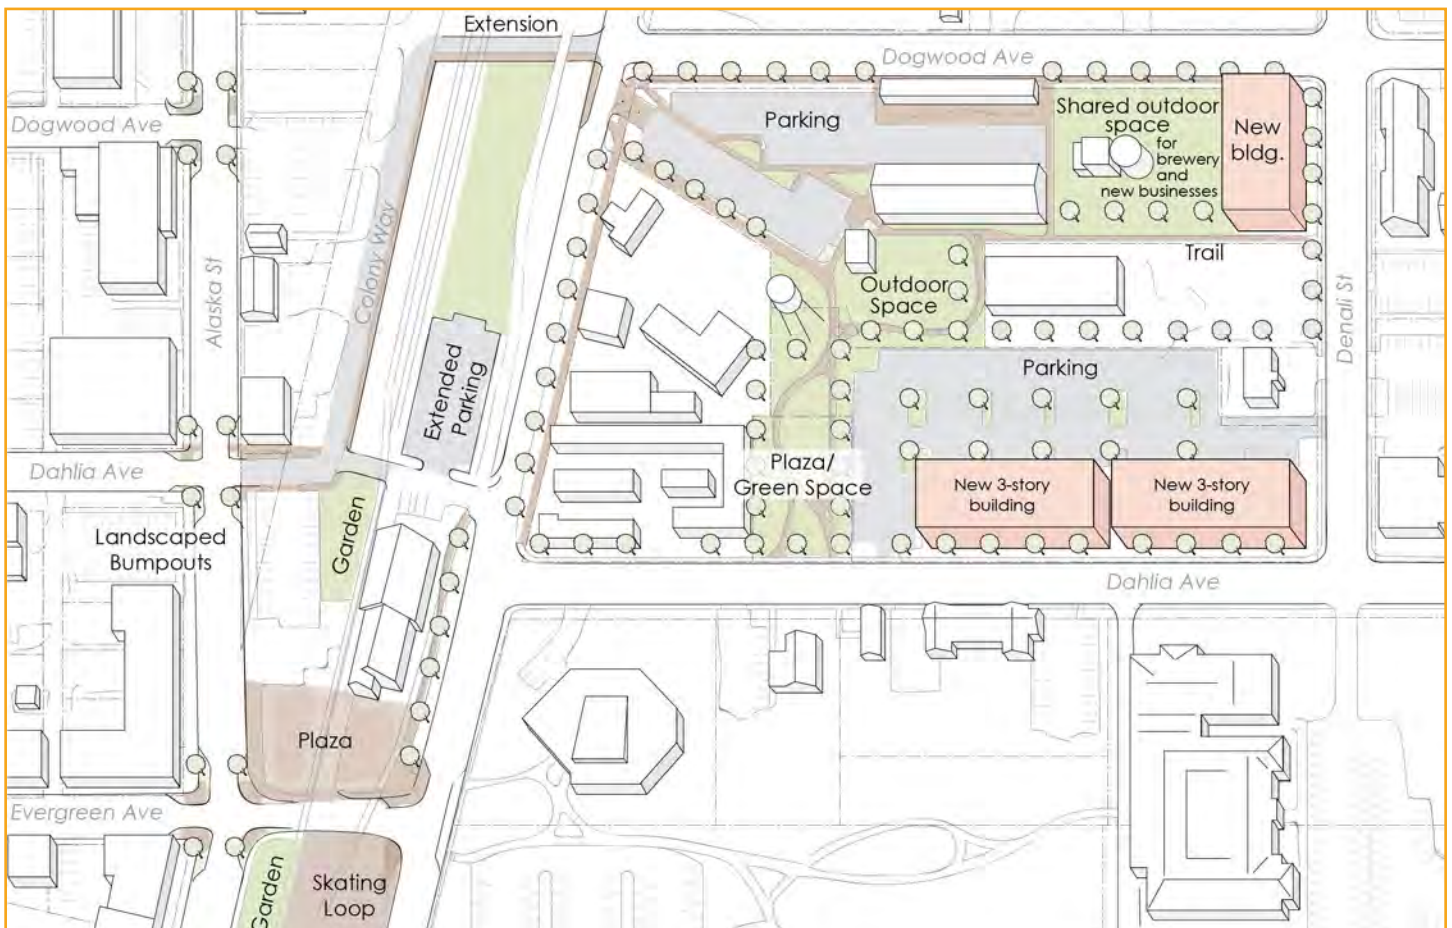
CONCEPT PLAN ALTERNATIVE B: "NEW INVESTMENT"
